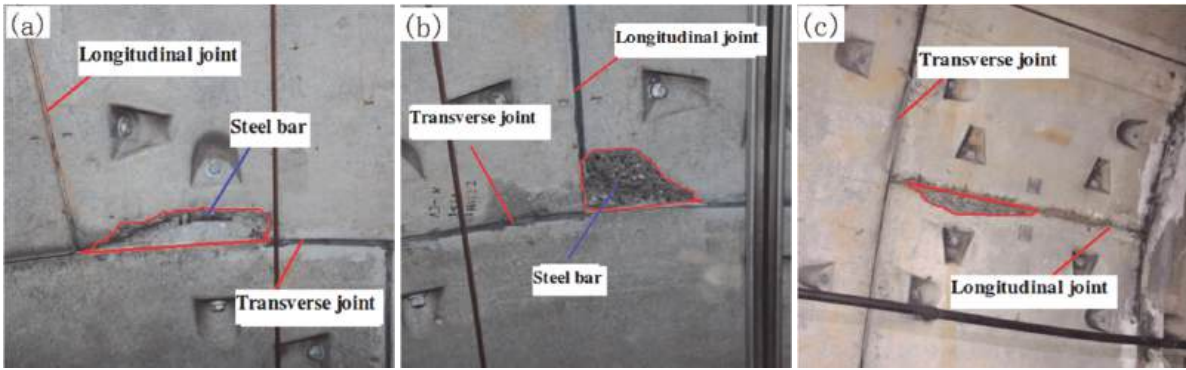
Positions of concrete spalling, (a) transverse joint edge; (b) joint corner; (c) longitudinal joint edge
